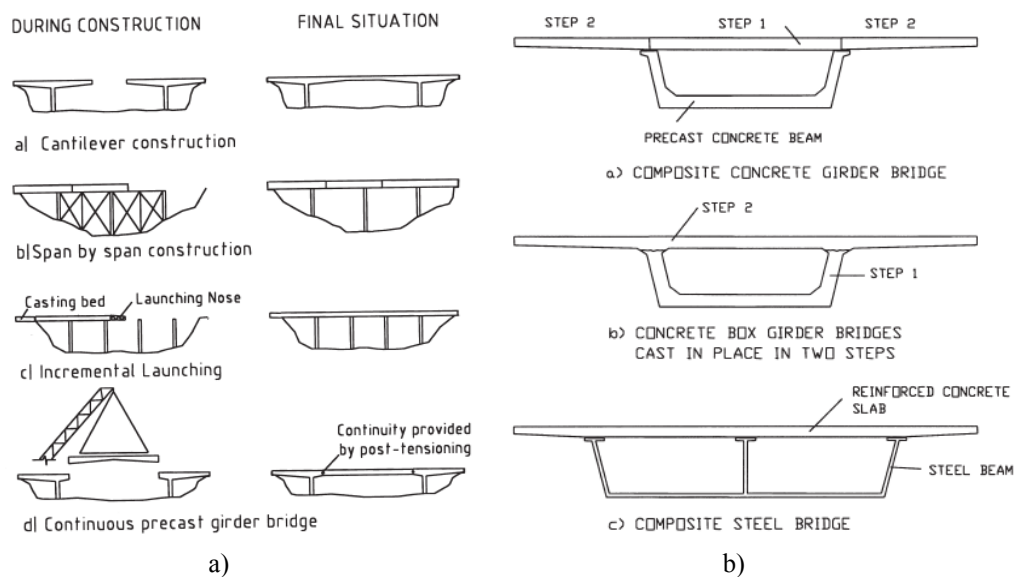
Segmental construction: a) longitudinal and b) cross section (Mari 2000)
